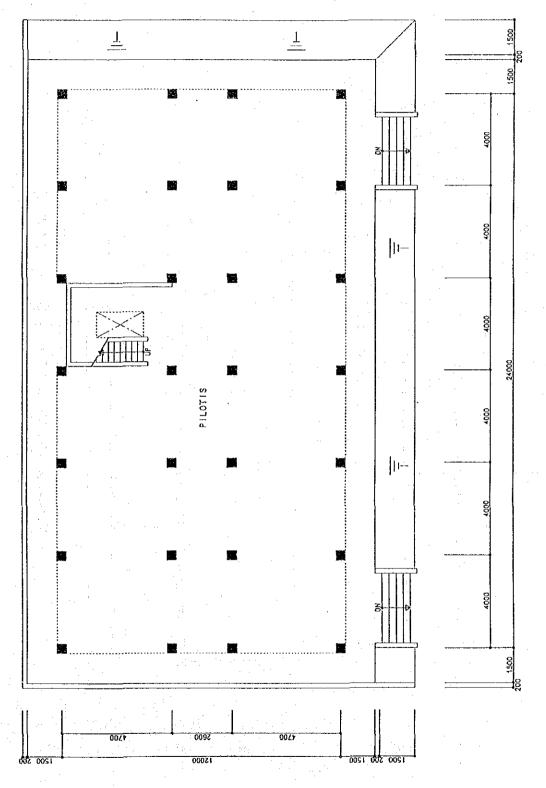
(1) GROUND FLOOR PLAN (4-CLASSROOM TYPE)
